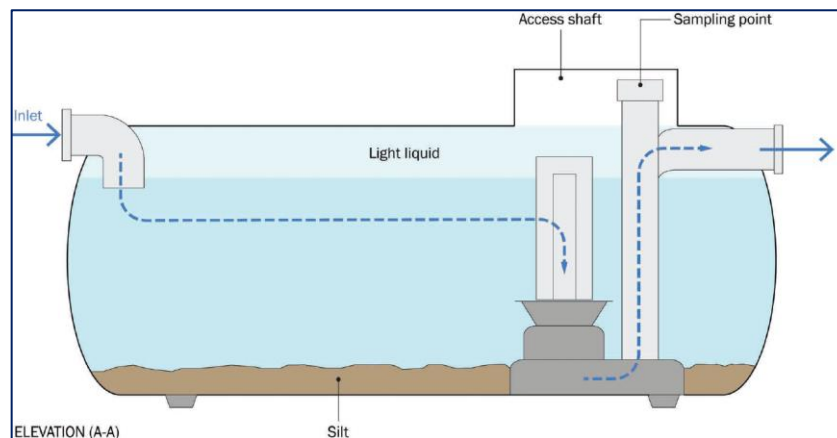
Typical Section Detail of Fuel Separator (CIRIA C753)
